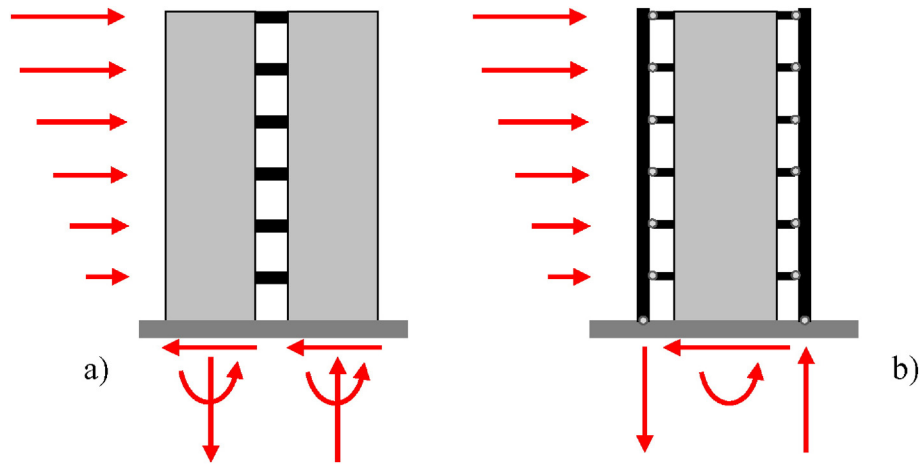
Base reactions under horizontal loads in: (a) a conventional coupled wall system made by two coupled walls; and (b) the proposed coupled wall system made by one wall coupled to two side columns.
